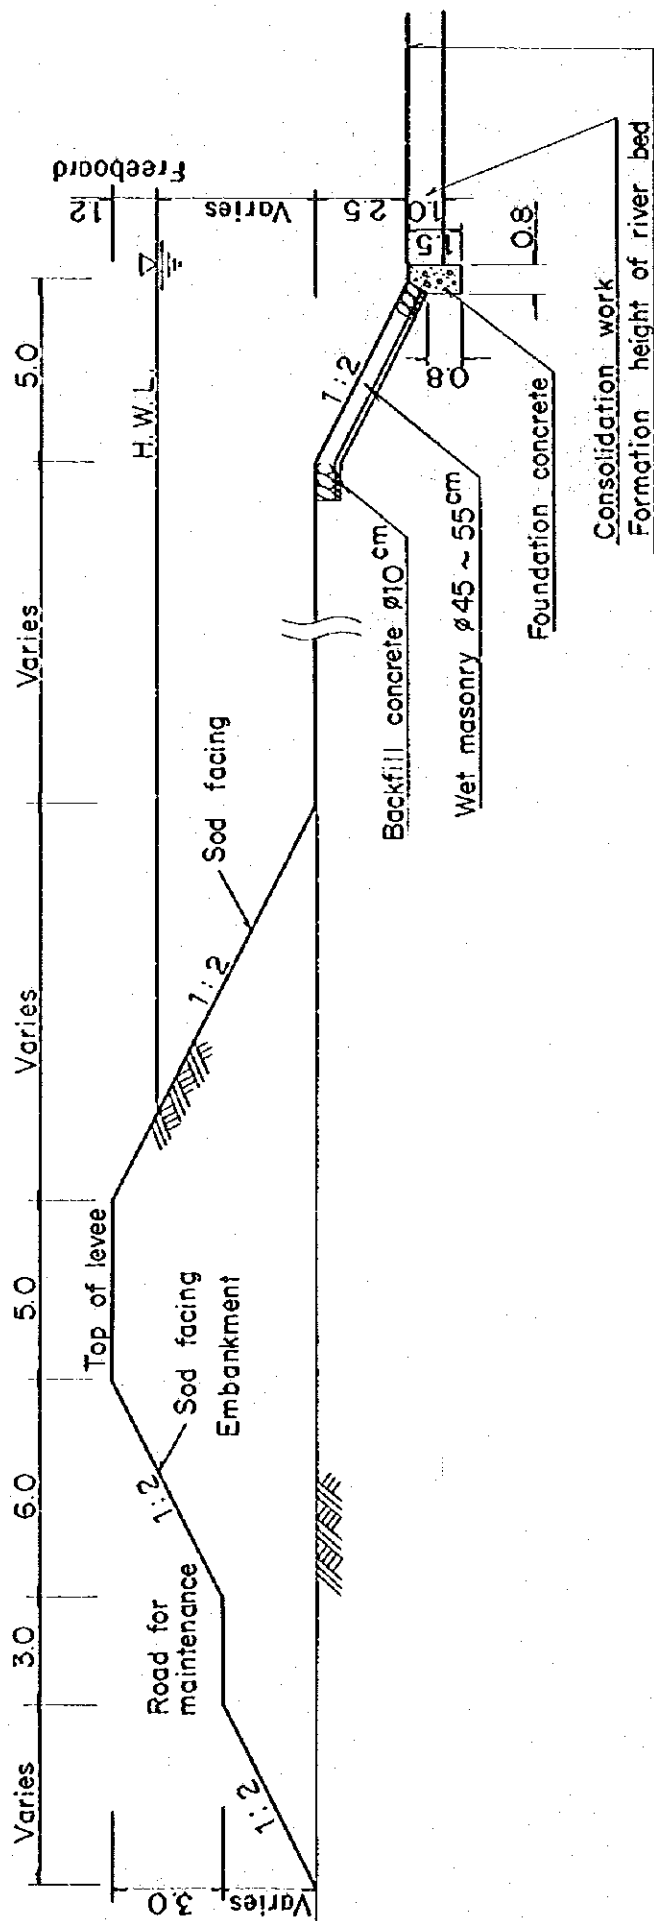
TYPICAL SECTION OF REVETMENT AND FOOT PROTECTION
